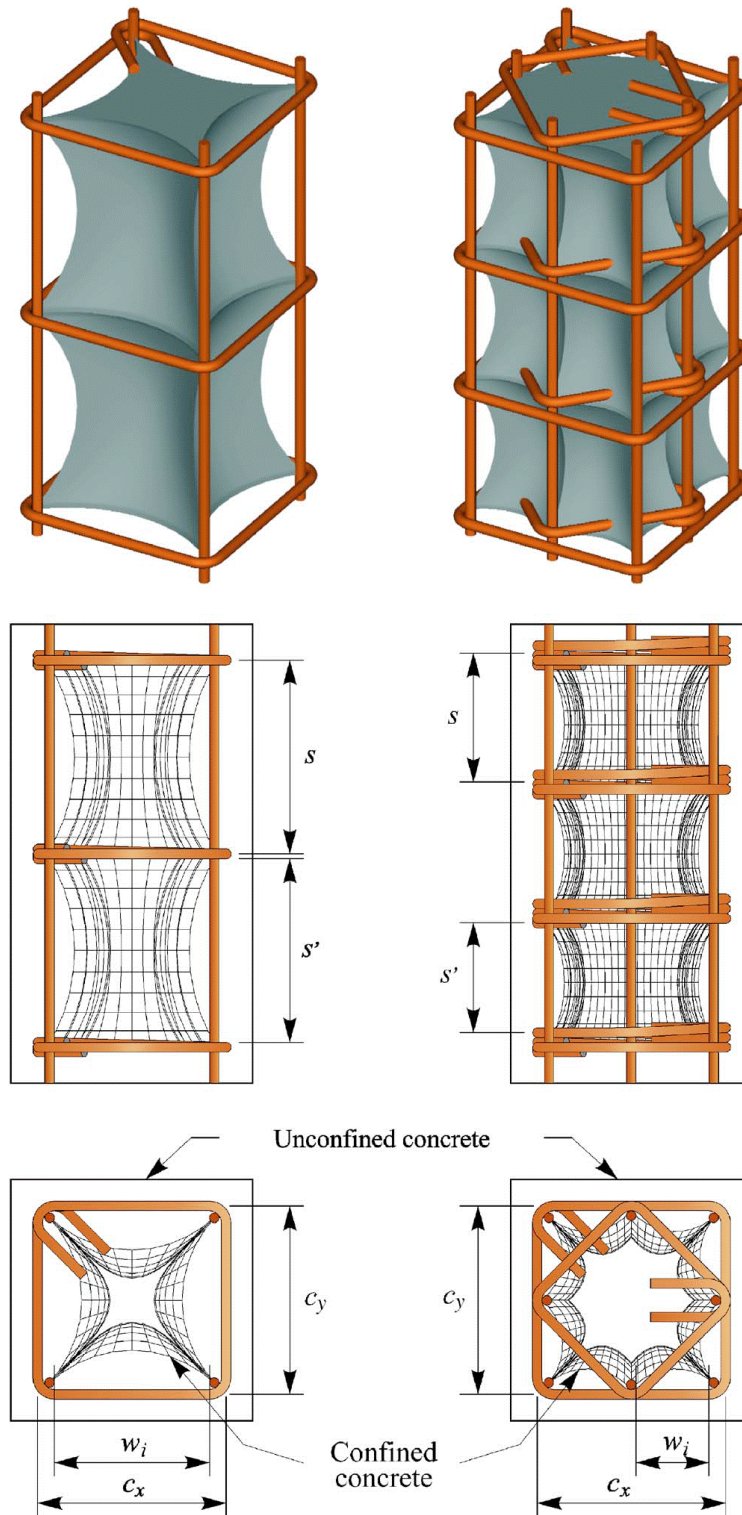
Confinement of reinforced concrete in square columns (Paultre and Légeron 2008)
